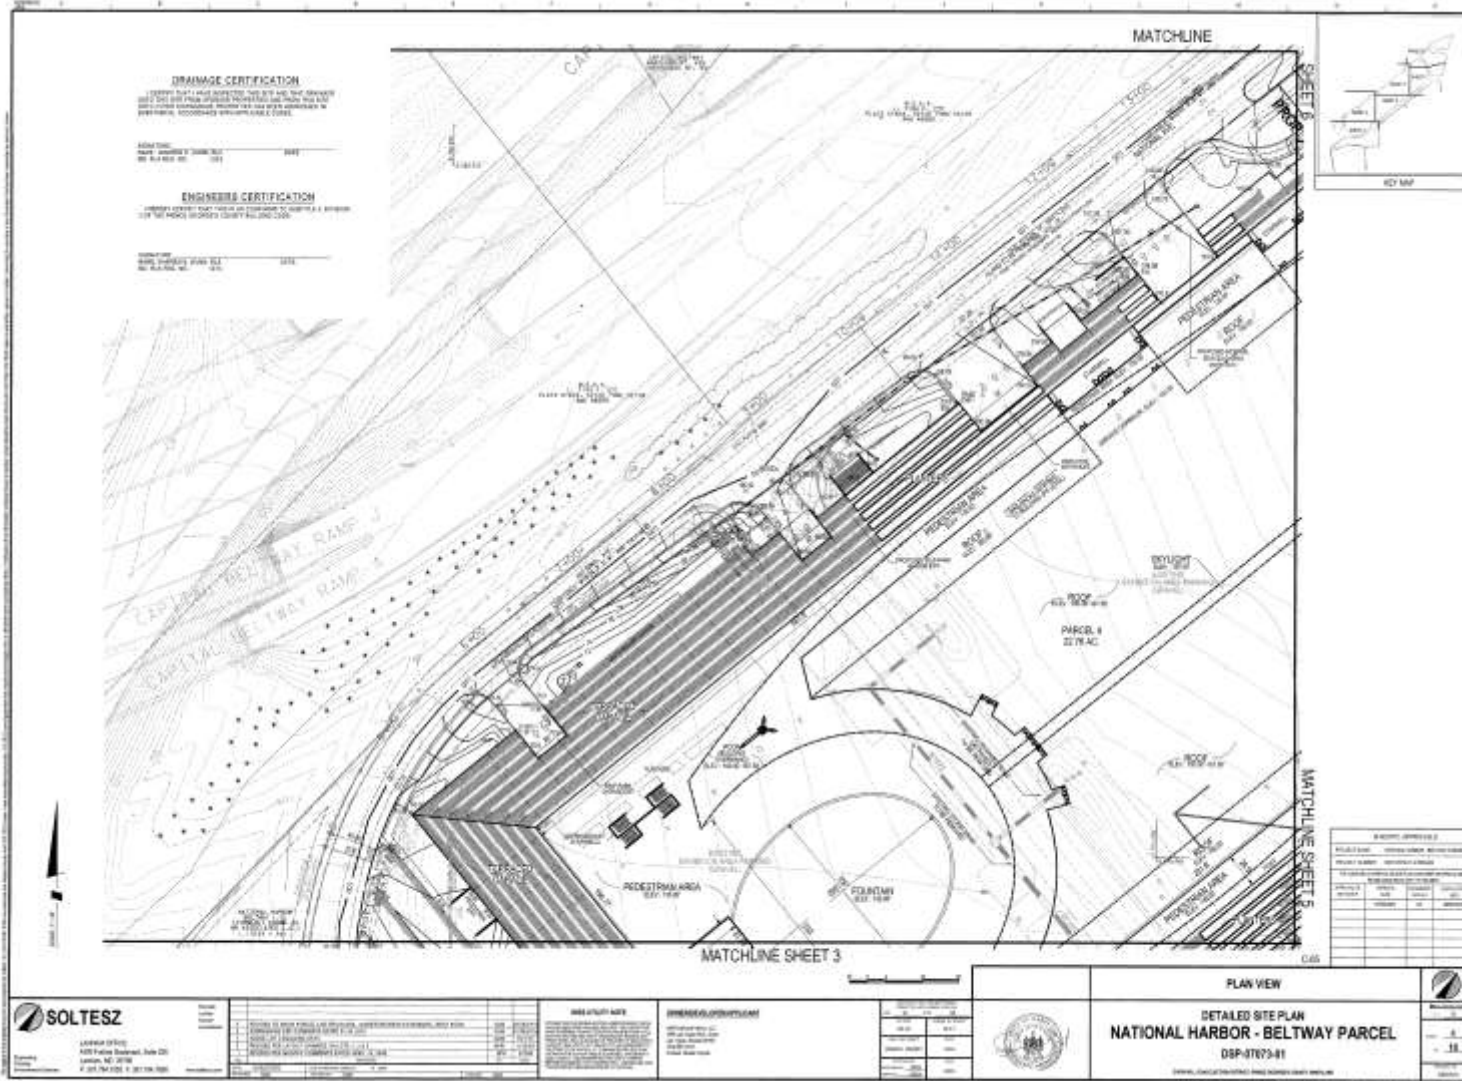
# DETAILED SITE PLAN SET (PAGE 3 OF 10)
